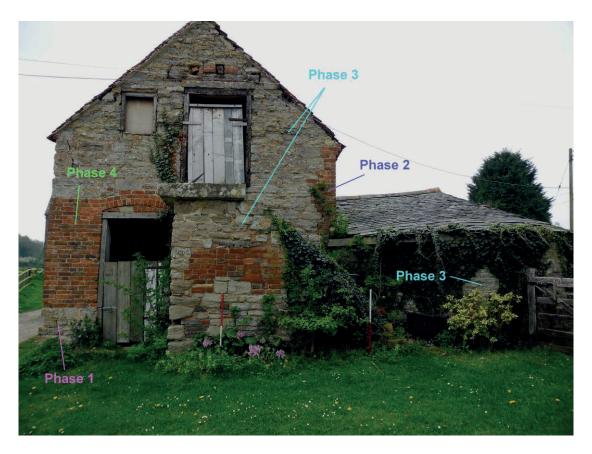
View looking SW showing NE facing gable elevation of Barn A with adjacent horse engine house (to right of picture)
